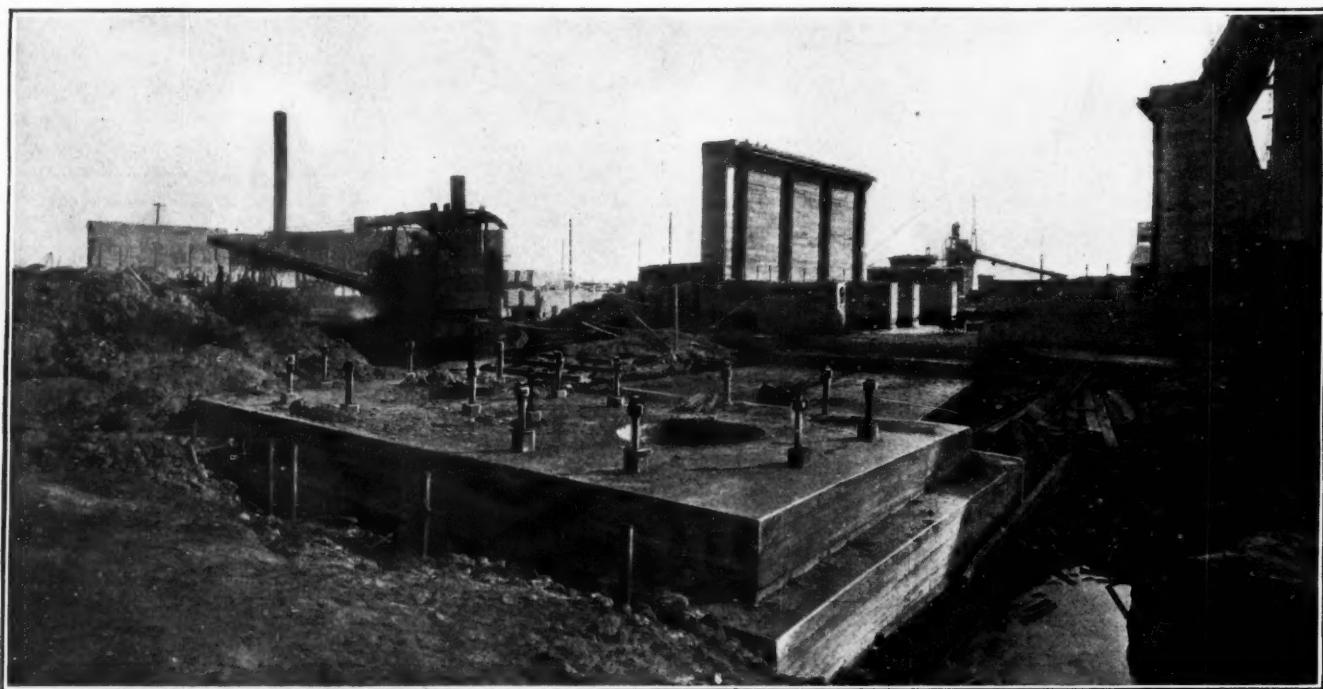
LARGE CONCRETE FOUNDATION WITH HOLDING-DOWN BOLTS IN PLACE
